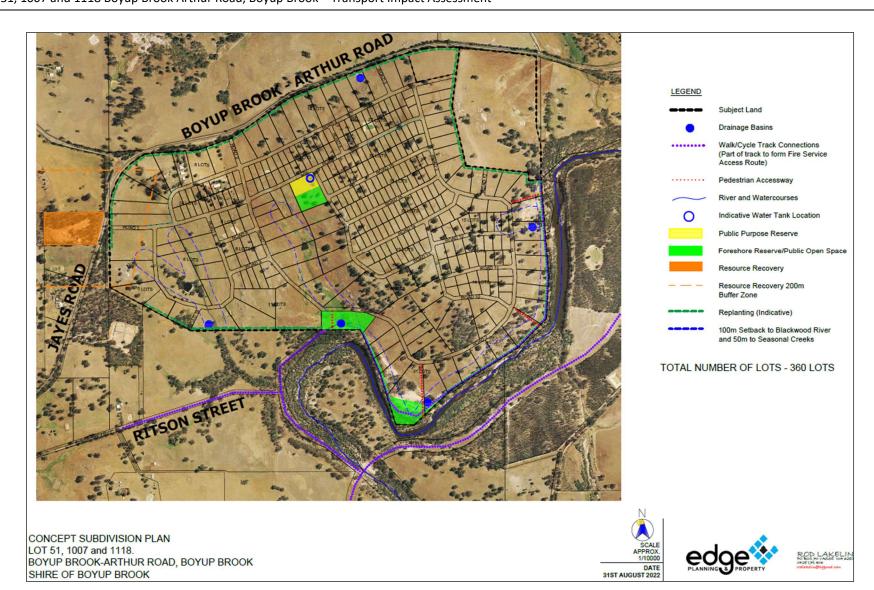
Site Concept Plan Scenario 1 Source: Edge Planning & Property
